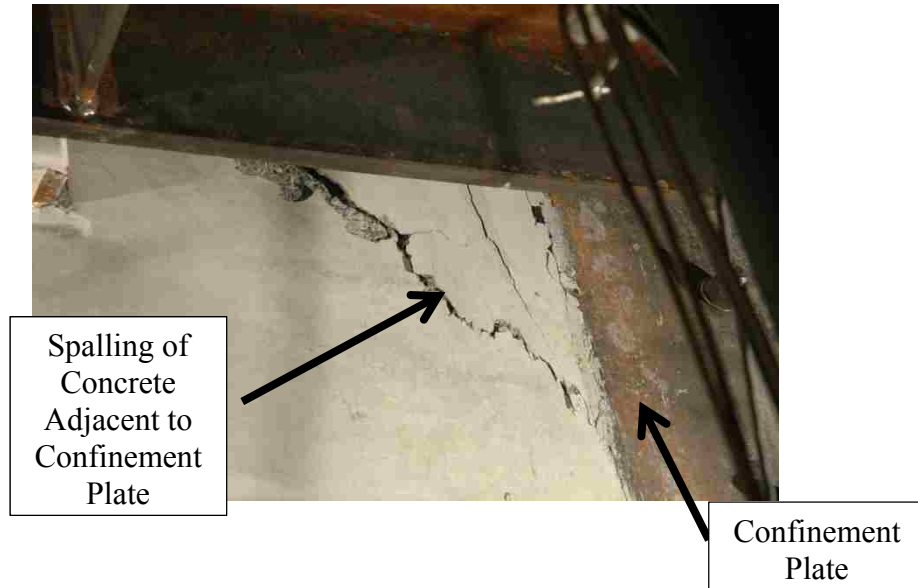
Spalling of Plate-Confined Panel
